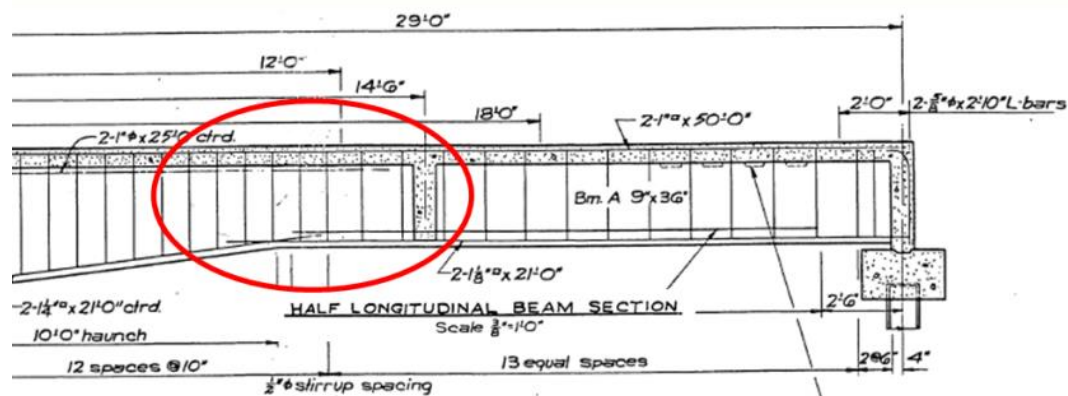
As-built elevation drawing of Mosier Bridge with highlighted critical section (ODOT, 2014)
